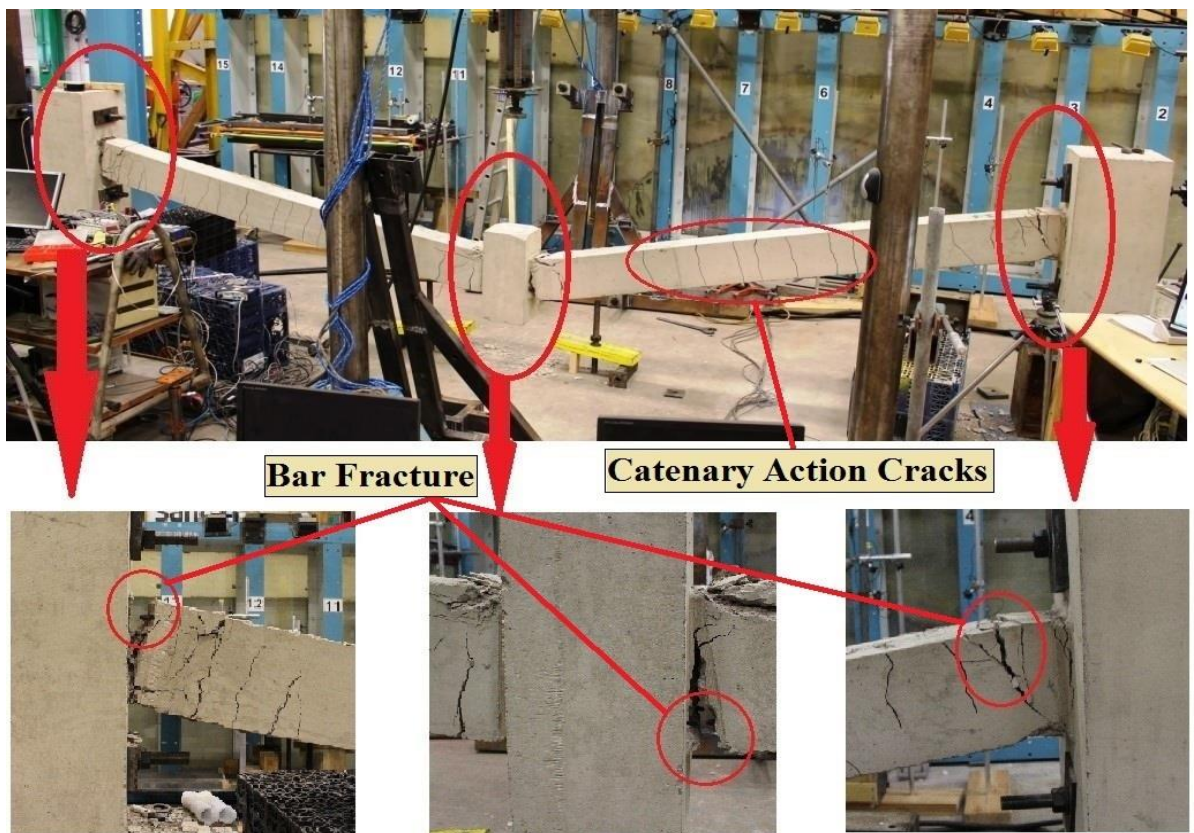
Crack pattern of specimen SS-3 at Catenary action
